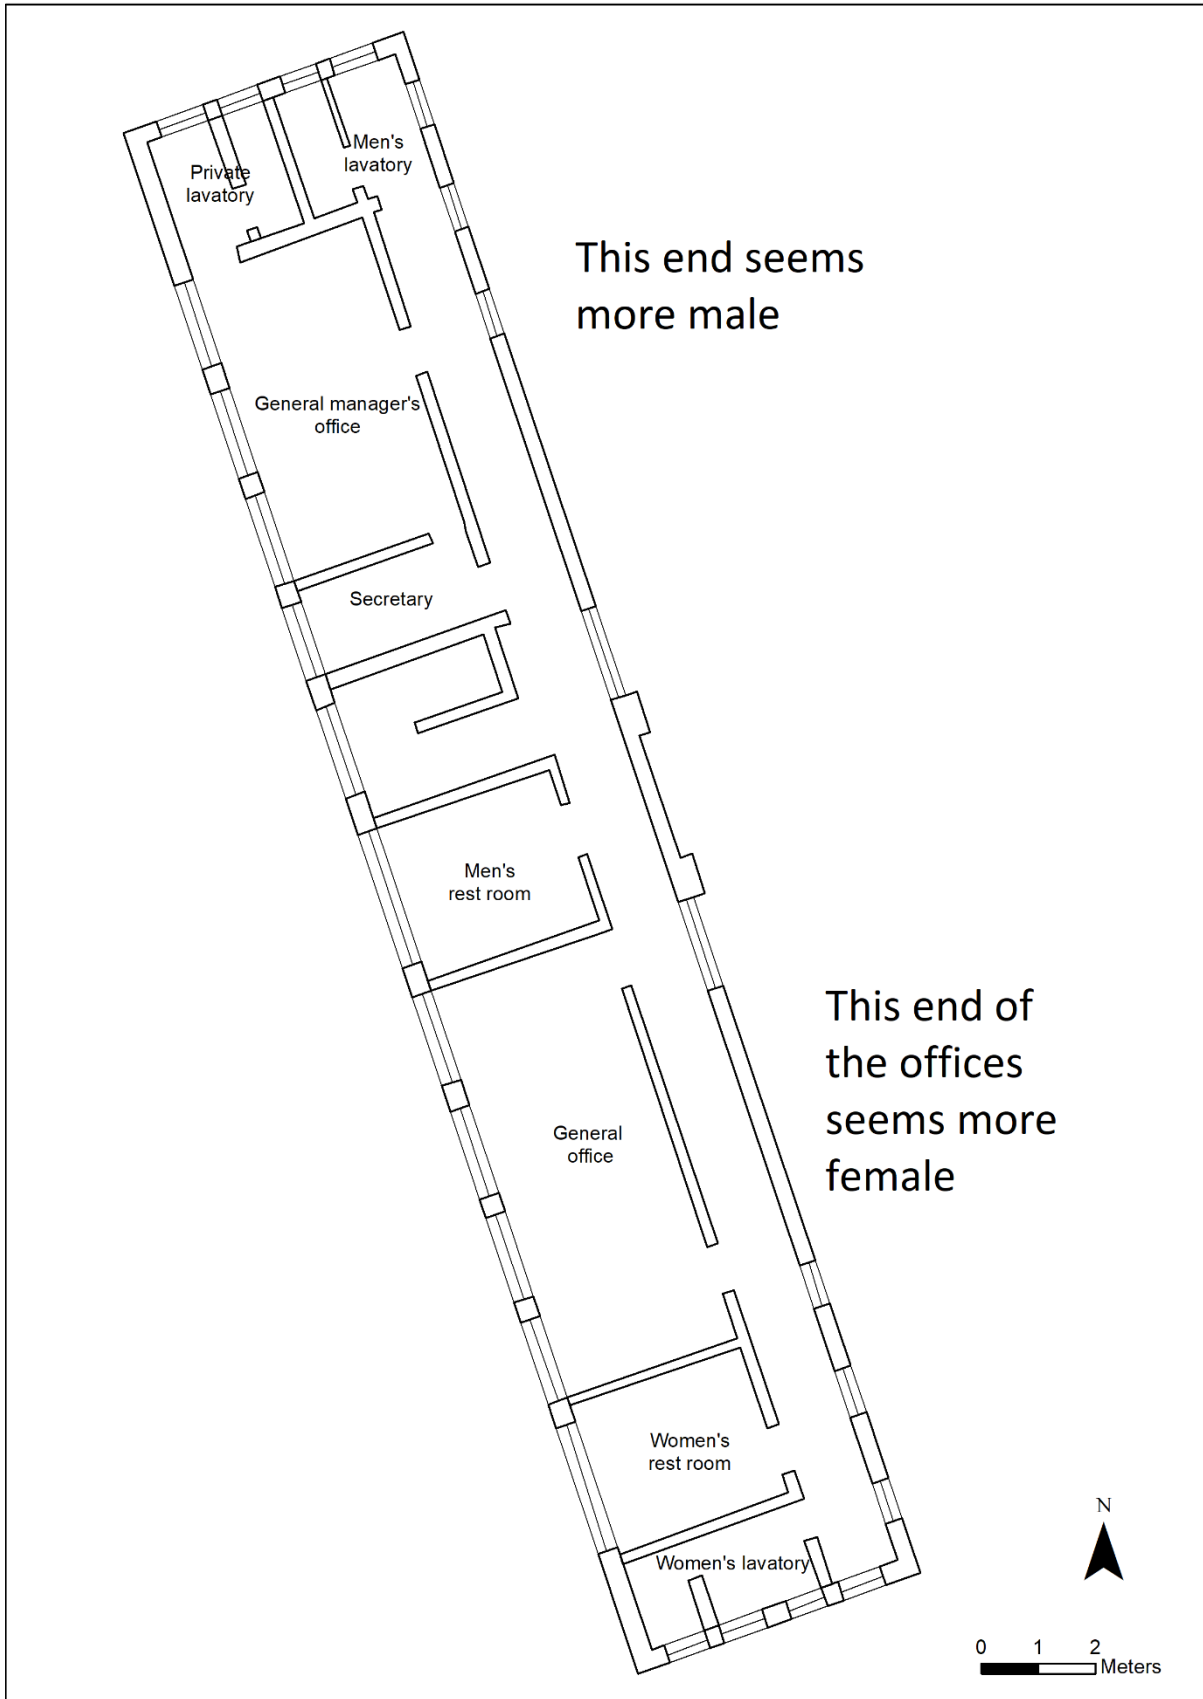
The L92 first-floor offices as built based on building control plan TWAM CB.GA/BC/plan/NET/87.
